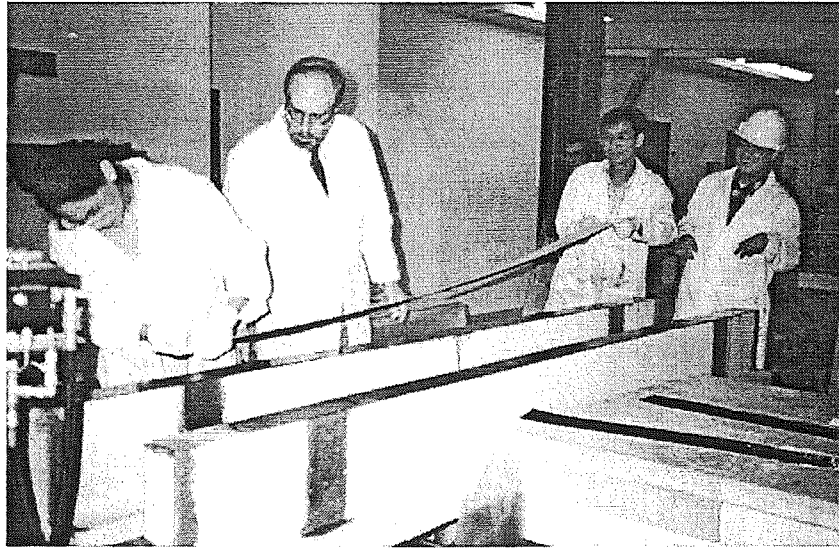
Gluing of CFRP sheet on the soffit of a beam.
